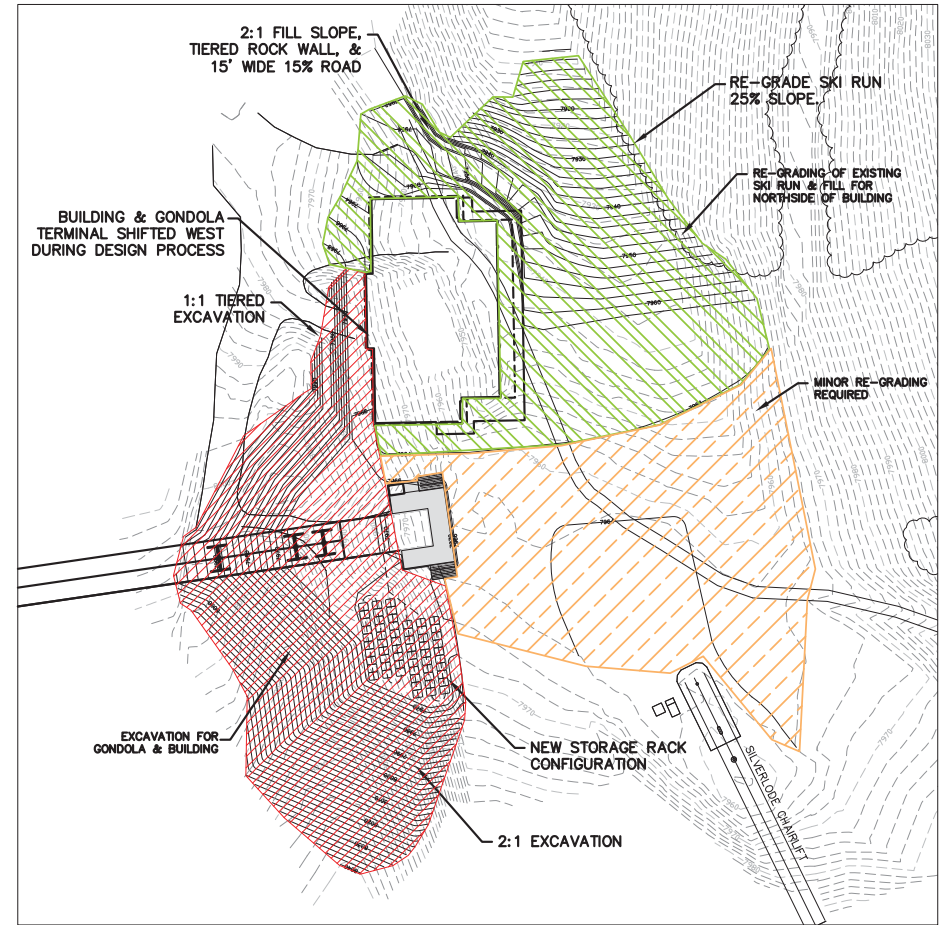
Exhibit F - New Gondola & Snow Hut Site Grading & Utility Plan
